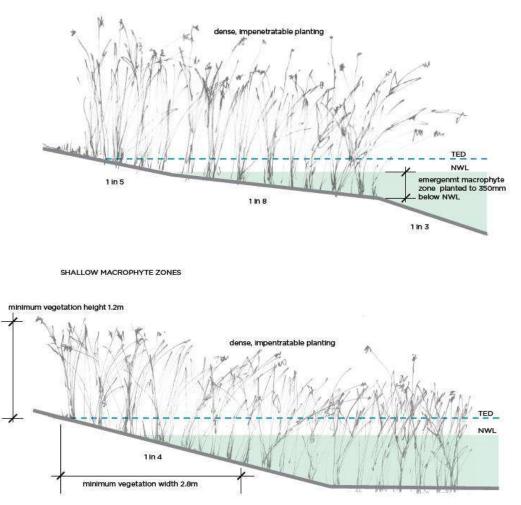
Typical cross section of deep and shallow macrophyte zones in a constructed wetland.
